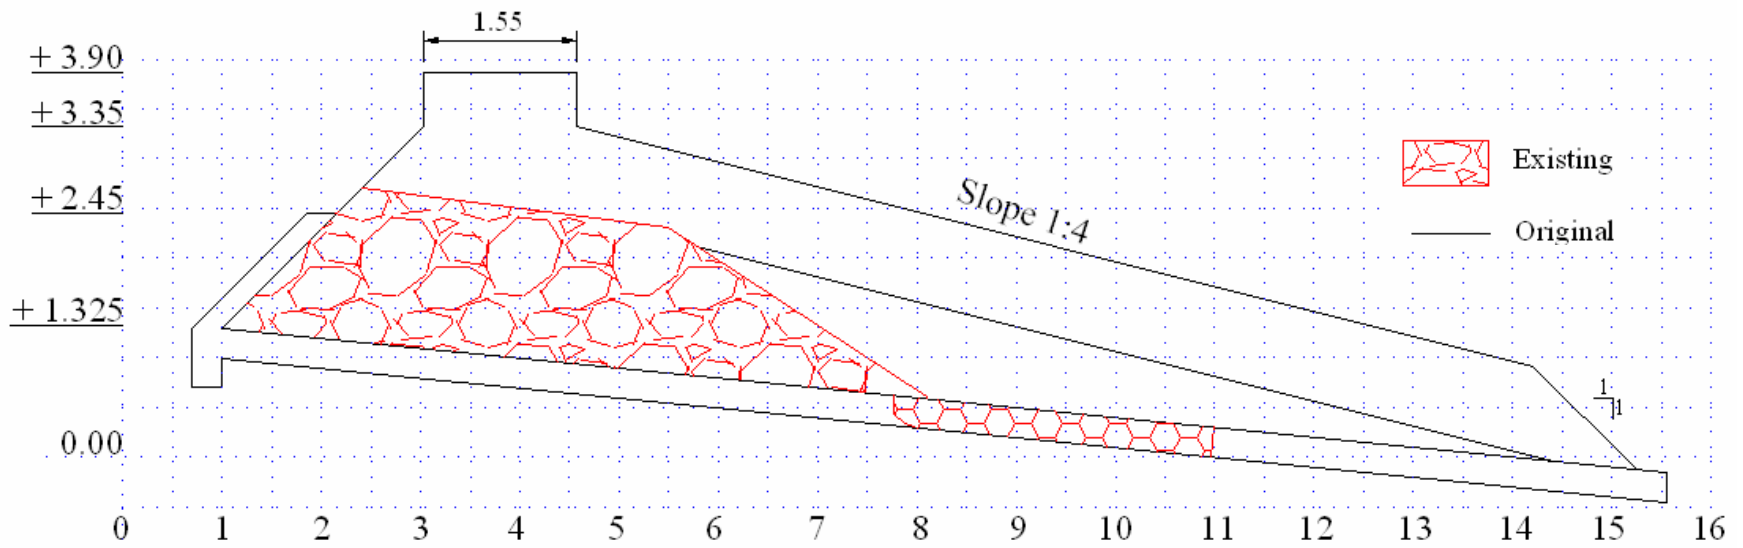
Cross-section of the existing damaged seawall (as per KID) at Thazhampally
